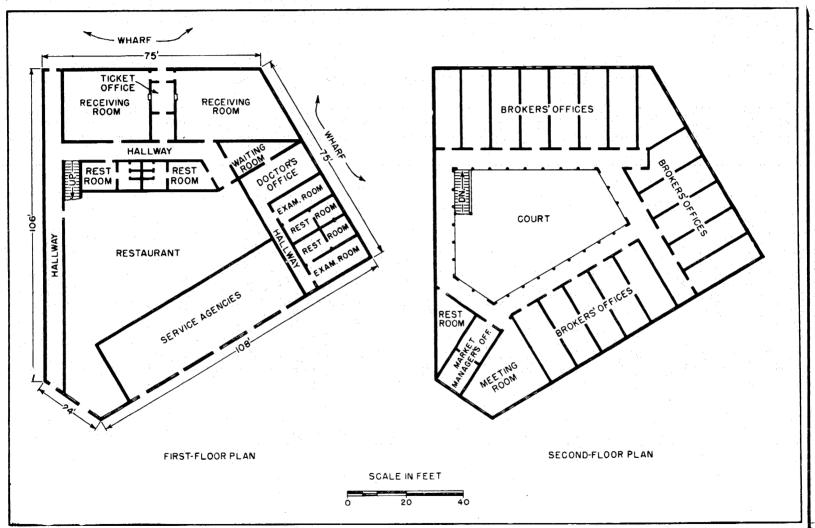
Suggested layout for the first and second floors of the proposed administration building.
